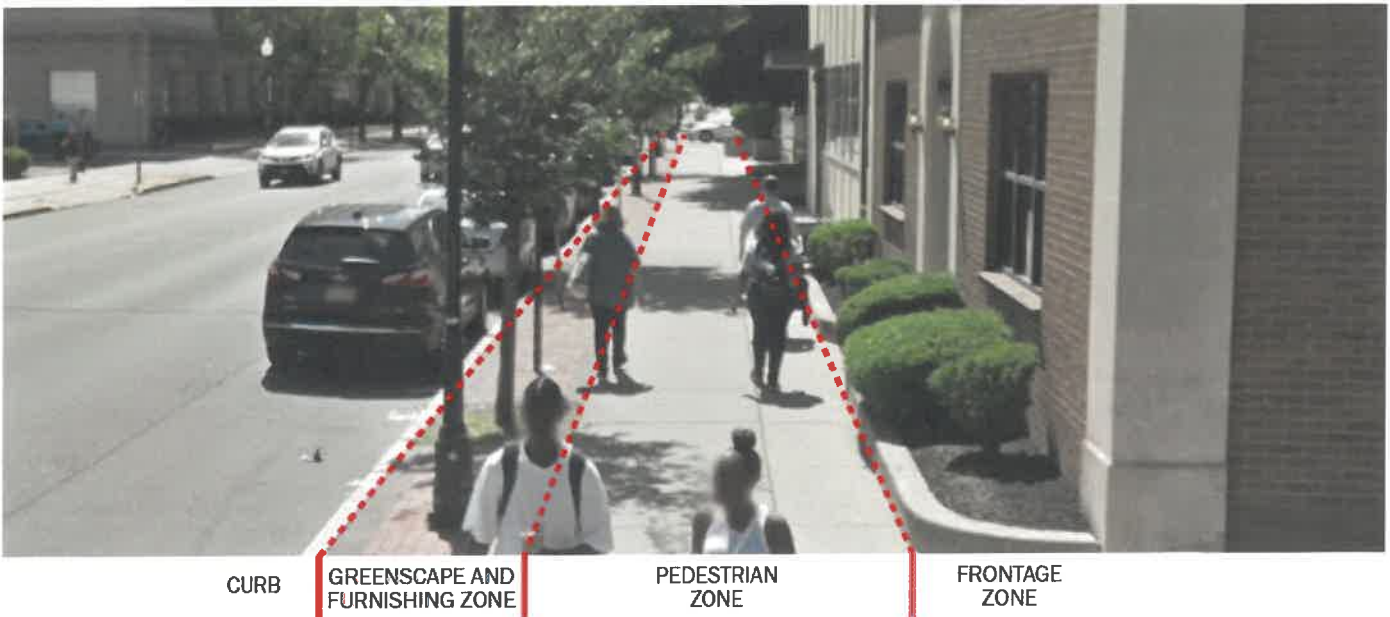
Zone elements of the sidewalk, plus the curb zone.
